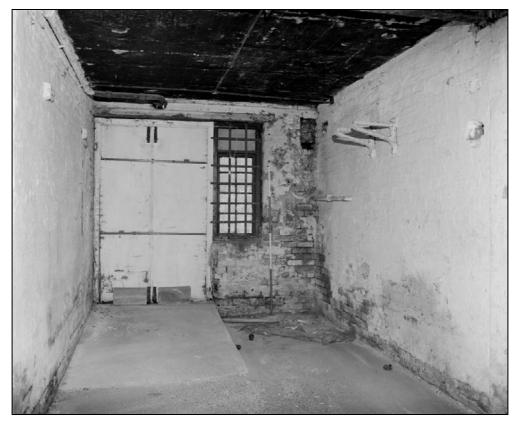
General view of northeast corner of G5, north range, showing widened doorway and inserted ramp (film 15.4)
